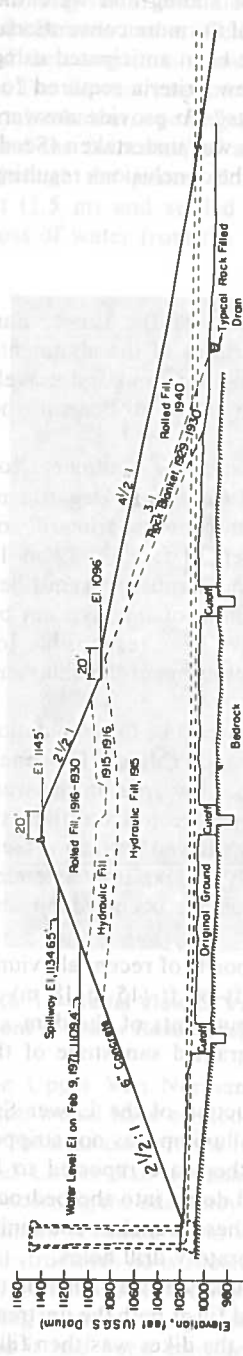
Cross Section of Lower San Fernando Dam (Los Angeles Department of Water and Power) (1 ft = 0.305 m)
